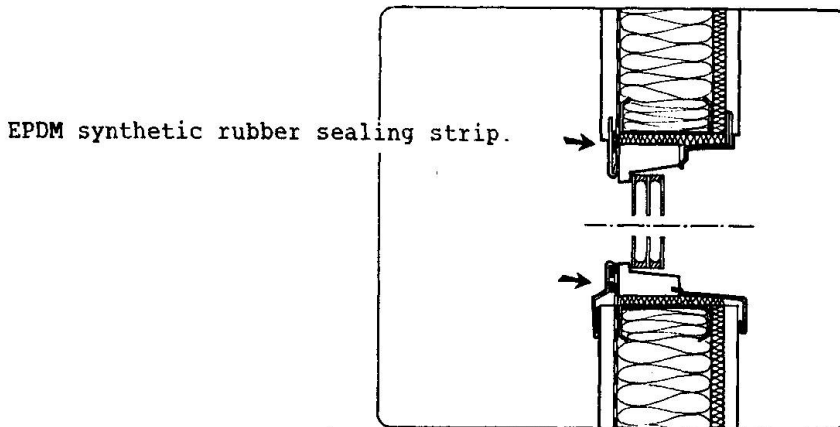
Window detailing. The plastic sheet in the wall is drawn over the window frame and fastened with a special sealing strip. An EPDM synthetic rubber sealing strip between the plastic sheet and the window frame considerably reduces the risk for air-leakage.
